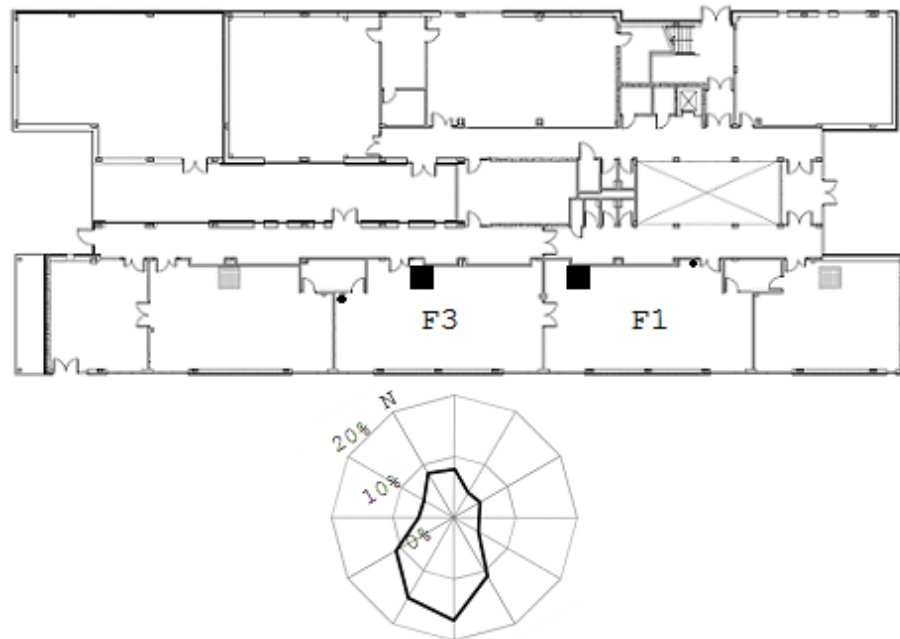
School F, plan view, ground floor. F1 and F3, floor area 104.30 m².
